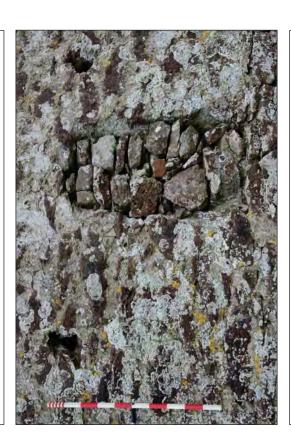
Detailed Shot Showing Blocked Window and Cleat Holes in Northern Elevation
